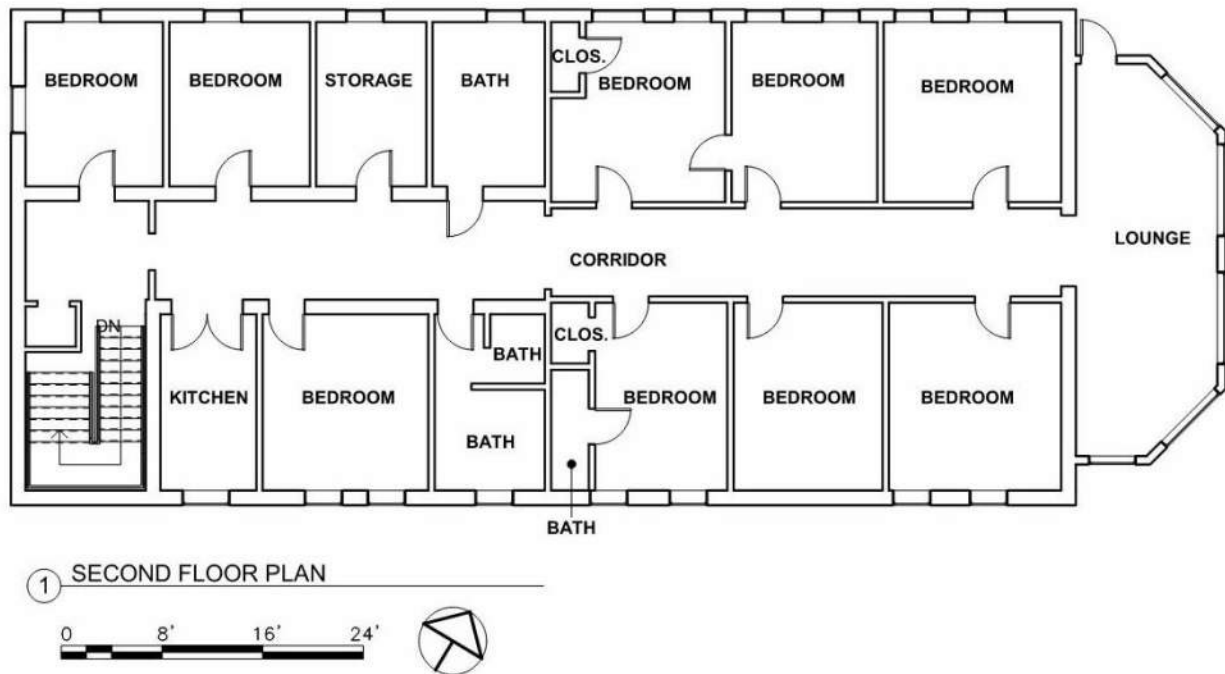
Sketch Plan of Second Floor of Northern Guest House.
